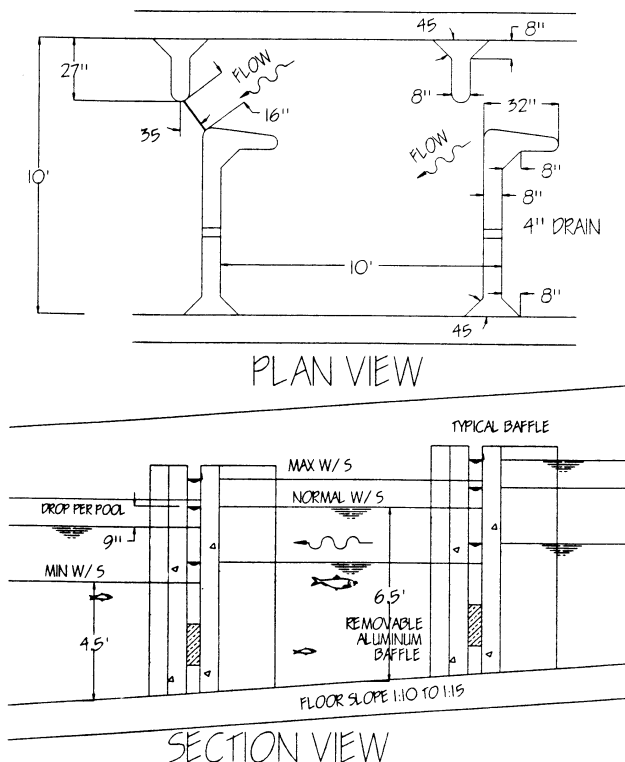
Plan and section views of a typical vertical slot fishway.
